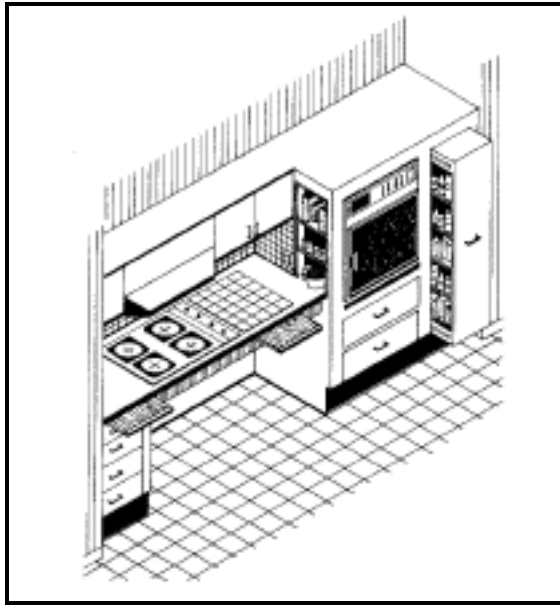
These illustrations show details of the kitchen floor plan on the preceding page.
